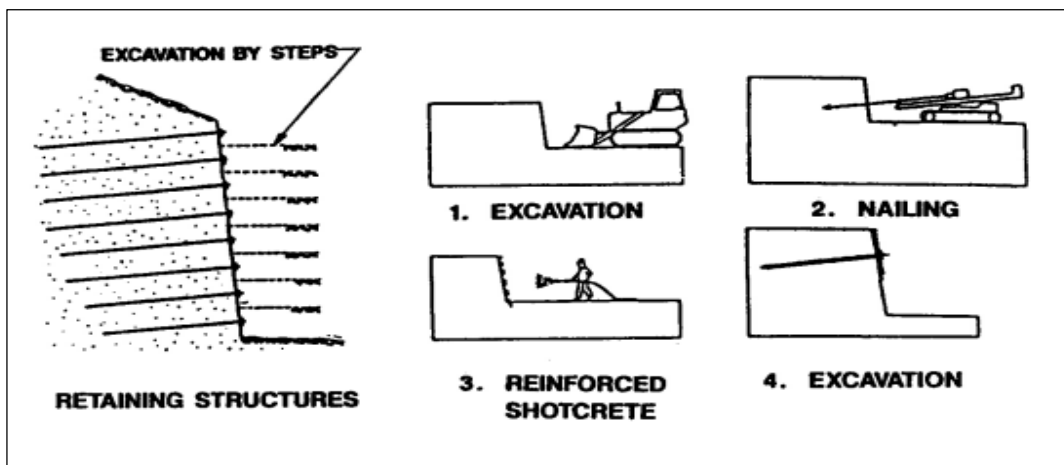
Main applications of soil nailing (Abramson, Lee, Sharma, & Boyce, 2002)
